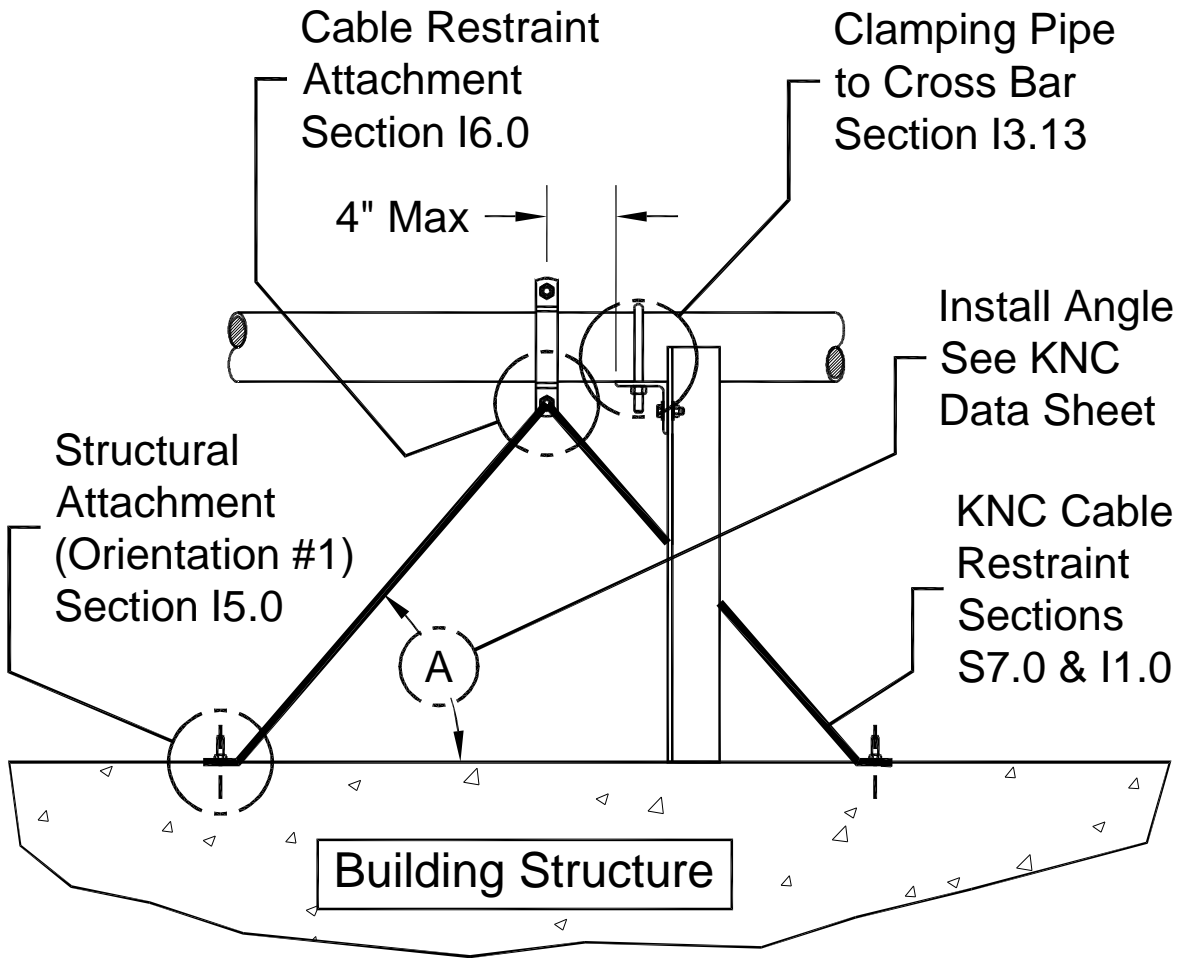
; Longitudinal (L) Cable Restraint Schematic Arrangement for Floor or Roof Mounted Pipe – Restraints Attached to the Pipe – Each Pipe Must be Individually Restrained
